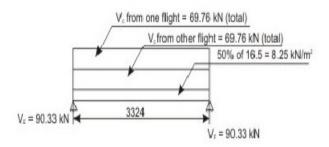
Calculation of loads, sec 2-2 of Example 9.1, (Fig. 9.20.10)
